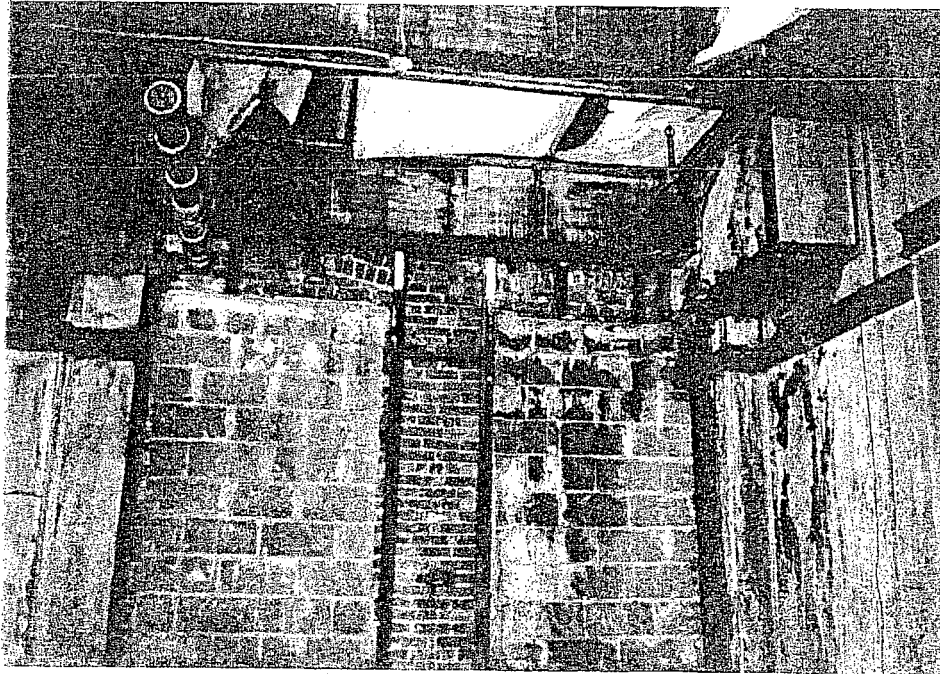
Block mortar joints and concrete masonry unit disintegration in bearing wall of Storage Area.
